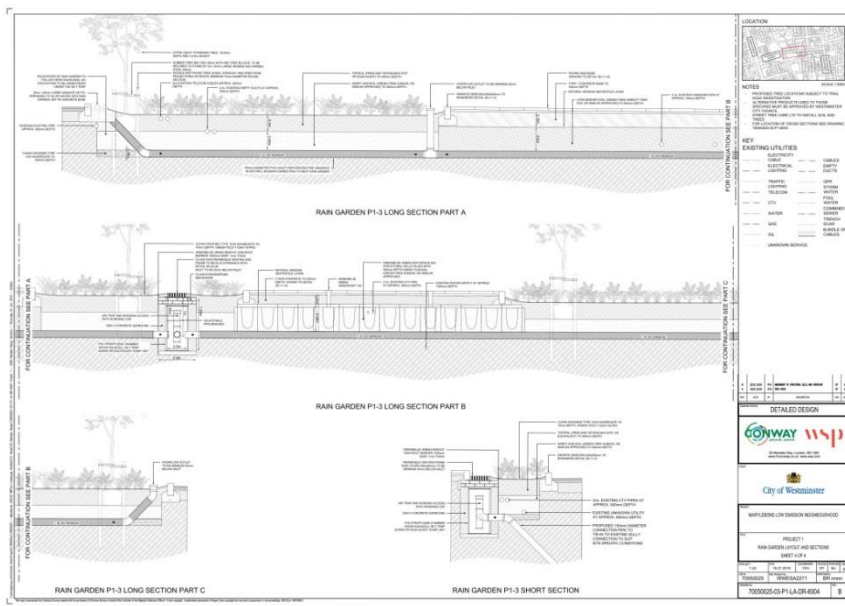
Rain Gardens design drawings in Package 3 – with extended root zone and storage beneath pavement
